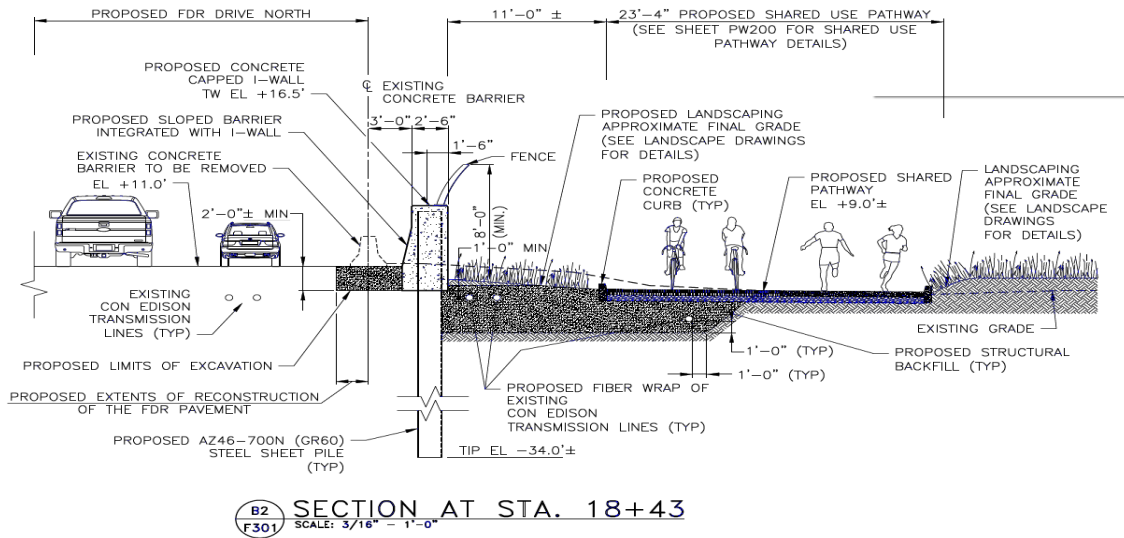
Proposed cross-section at station 18+43 featuring an I-wall as flood protection measure.
